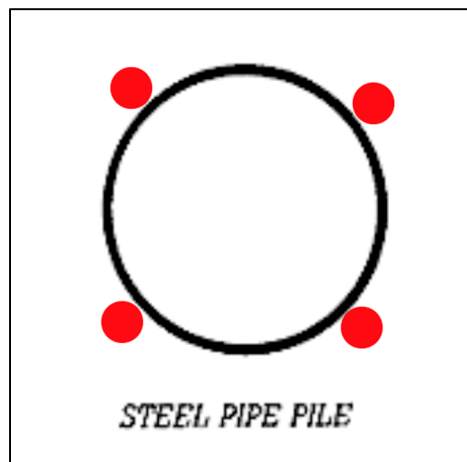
General Cross Section of Pipe Pile with Approximate Locations of Collected Soil Sample Sets (Red Circles) Around the Closed and Open-End Pipe Piles (modified from www.thecivilbuilders.com).
